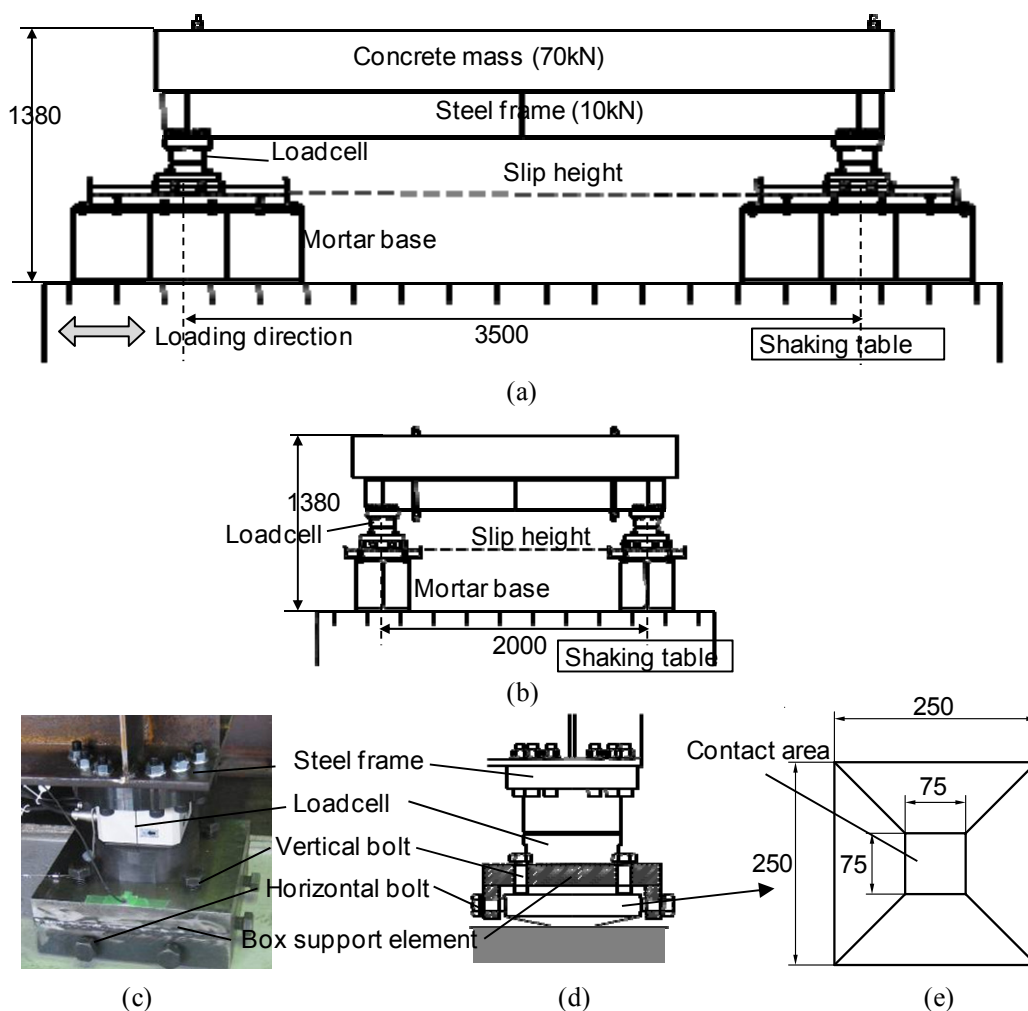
Dynamic test specimen: (a) Elevation from front; (b) Elevation from side; (c) Column base; (d) Column base section; (e) Base plate element
